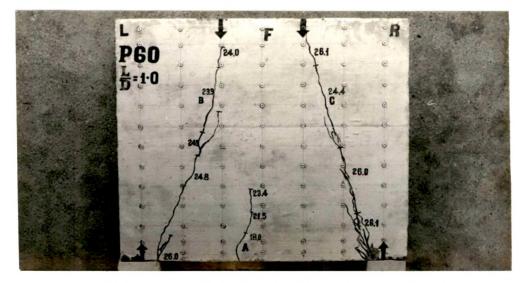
BEAMS OF PLAIN SERIES AFTER FAILURE
